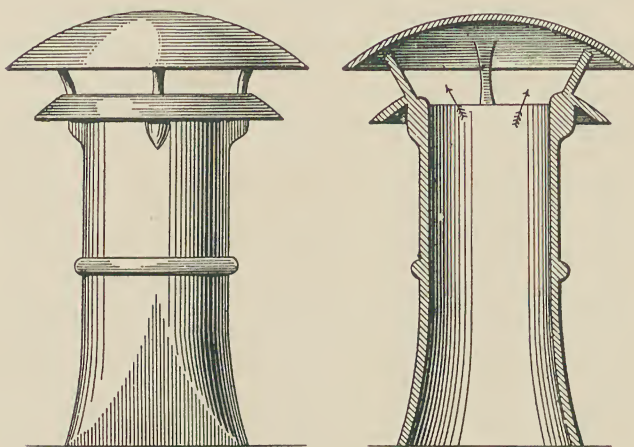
Elevation and Section of the Pembridge Chimney-cowl.
